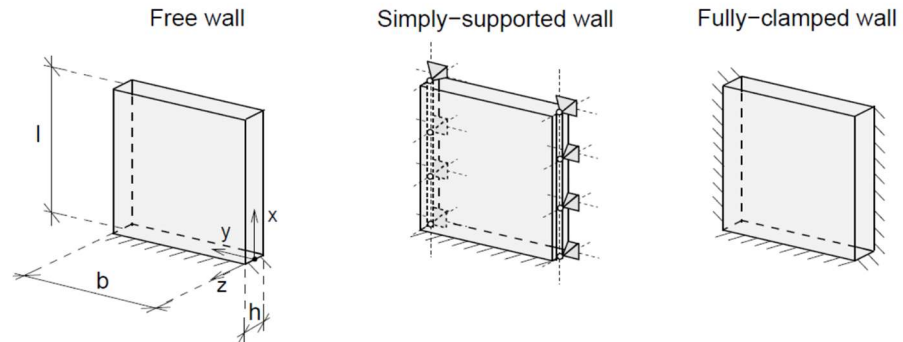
Configuration of the wall: free wall, simply clamped wall and fully clamped wall [62].
